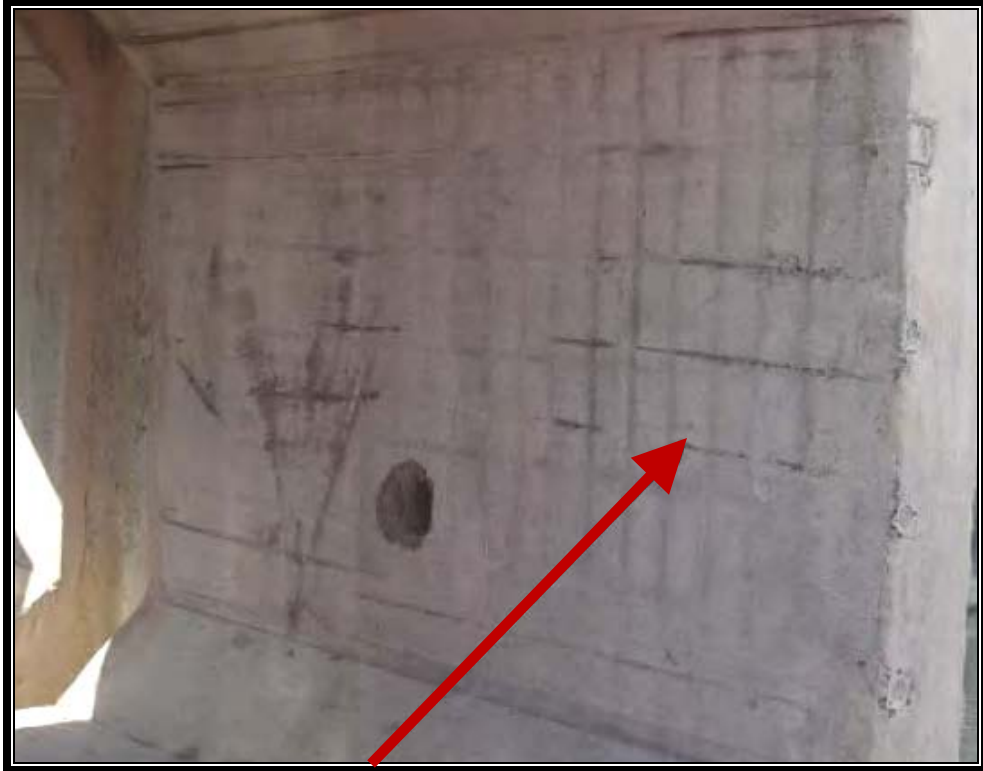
Exposed Box Culvert Reinforcement – Not Acceptable
